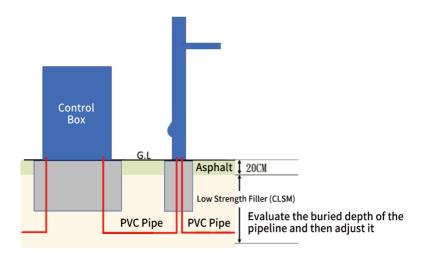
Pipe Trench Backfilling in Layers (Asphalt vs. Low Strength Filler)
